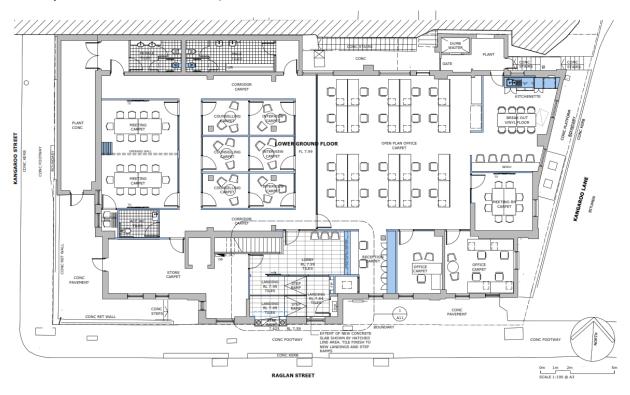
Raglan Street Lower Ground Floor Proposed Community Hub Layout (Building Assets Planning Design and Delivery Northern Beaches Council).
